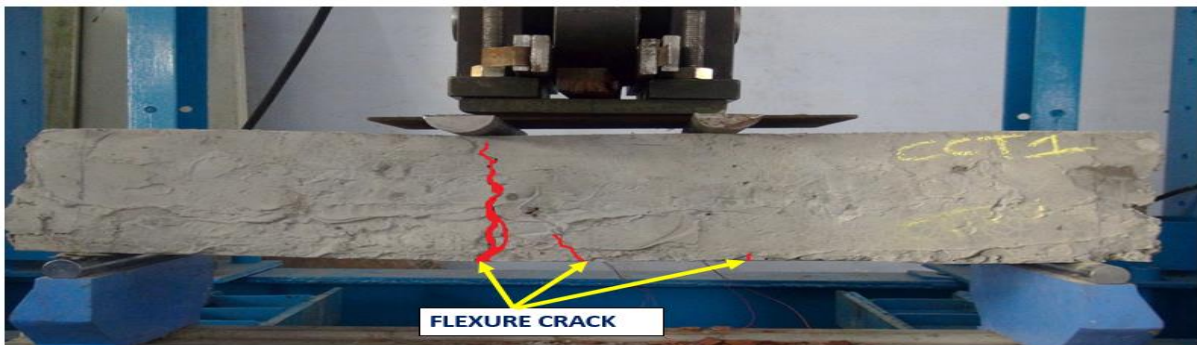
Failure of sandwich beam with cement mortar as bonding agent
